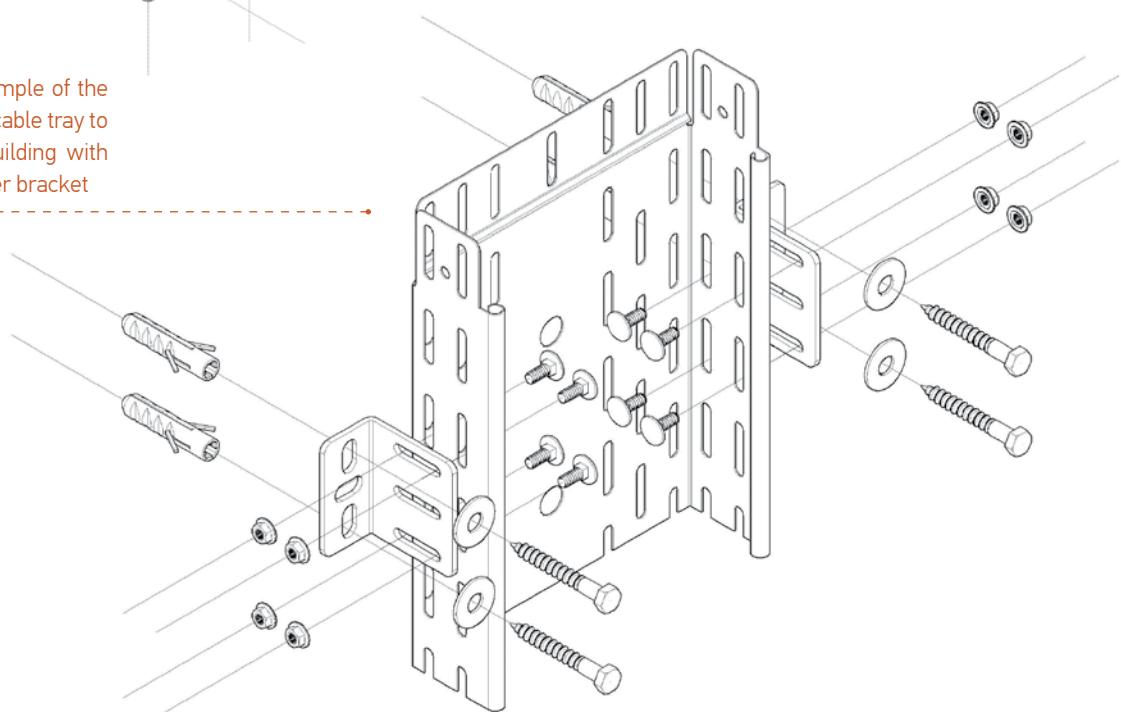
Example of the installation of the cable tray to the wall of the building with the NKP-NK corner bracket
